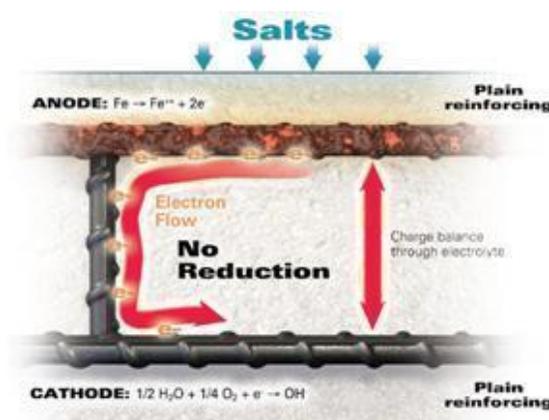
Corrosion of uncoated bars in concrete slab
